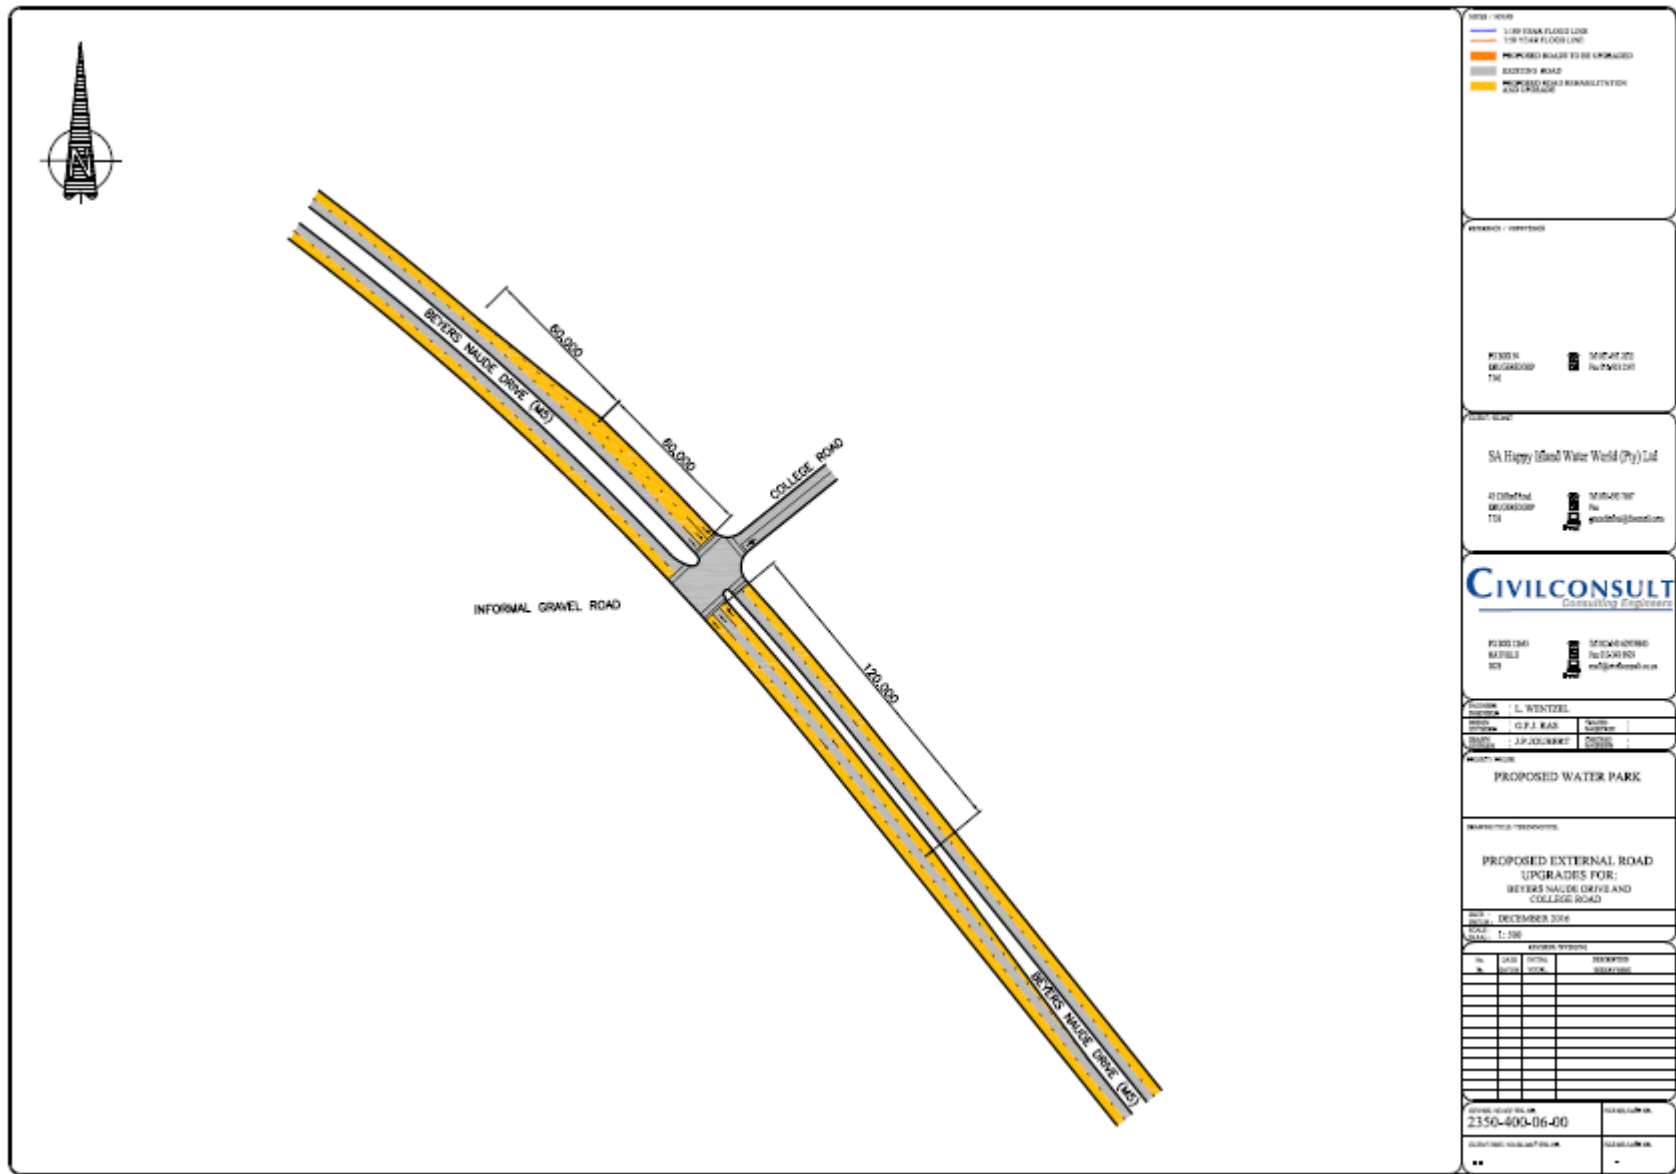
Proposed road rehabilitation and upgrades – Beyers Naude and College Road
